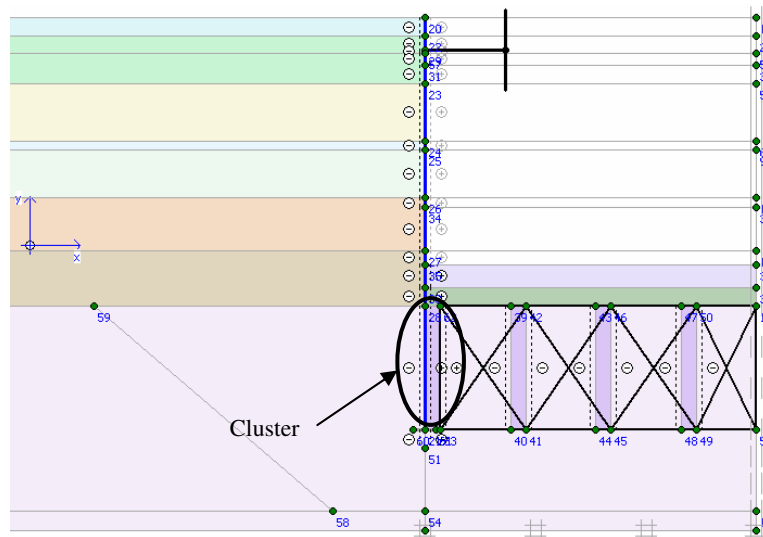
Alternative B: Cluster to diaphragm wall.
